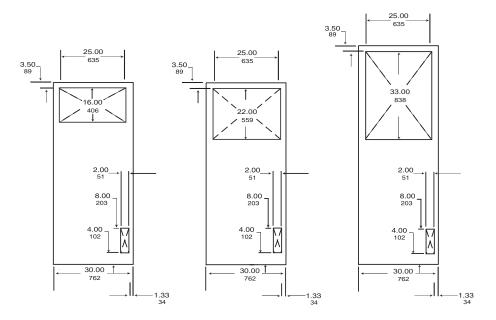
Top Conduit Entrance-Auxiliary Section (36-inch wide)
